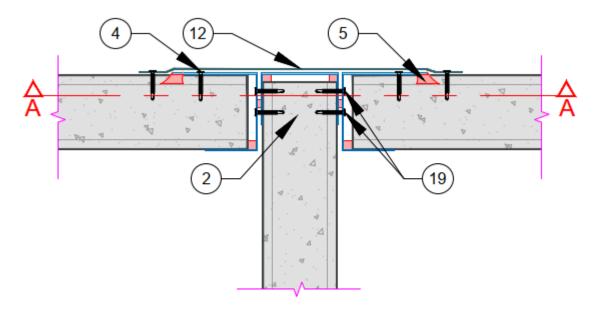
Dual void box riser – mid-wall connection when span is 6 m (metal flashing on unexposed side)
